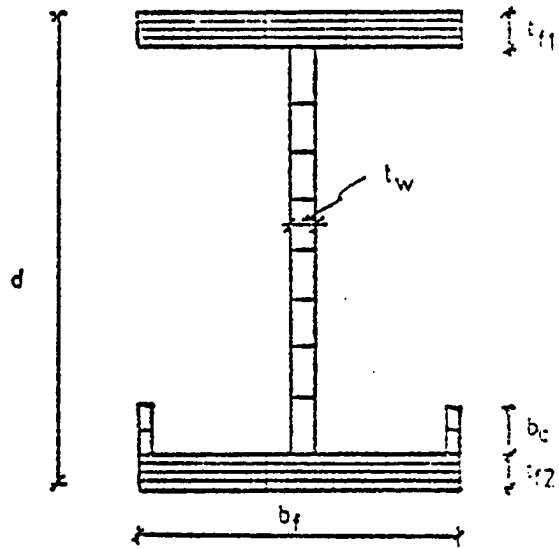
A Typical Cross-Section Divided in Small Segments
